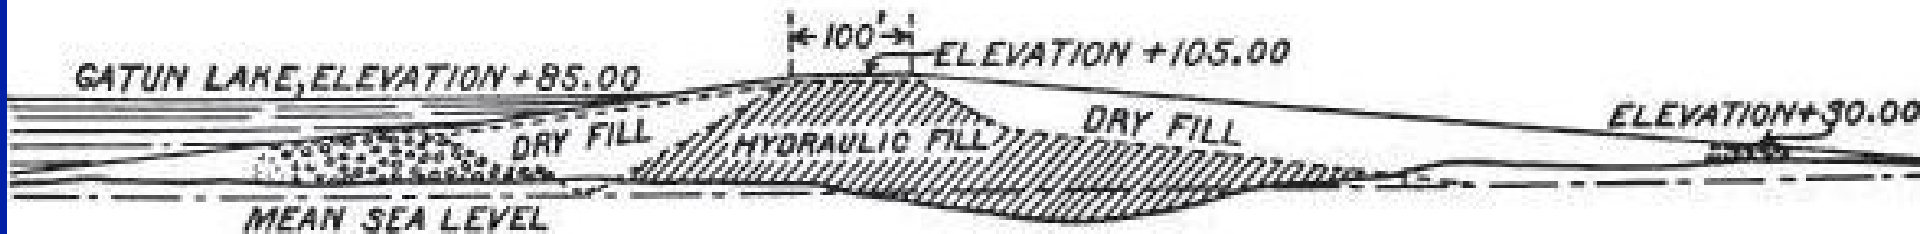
Cross section of Gatun Dam showing dry fill and hydraulic fill.
